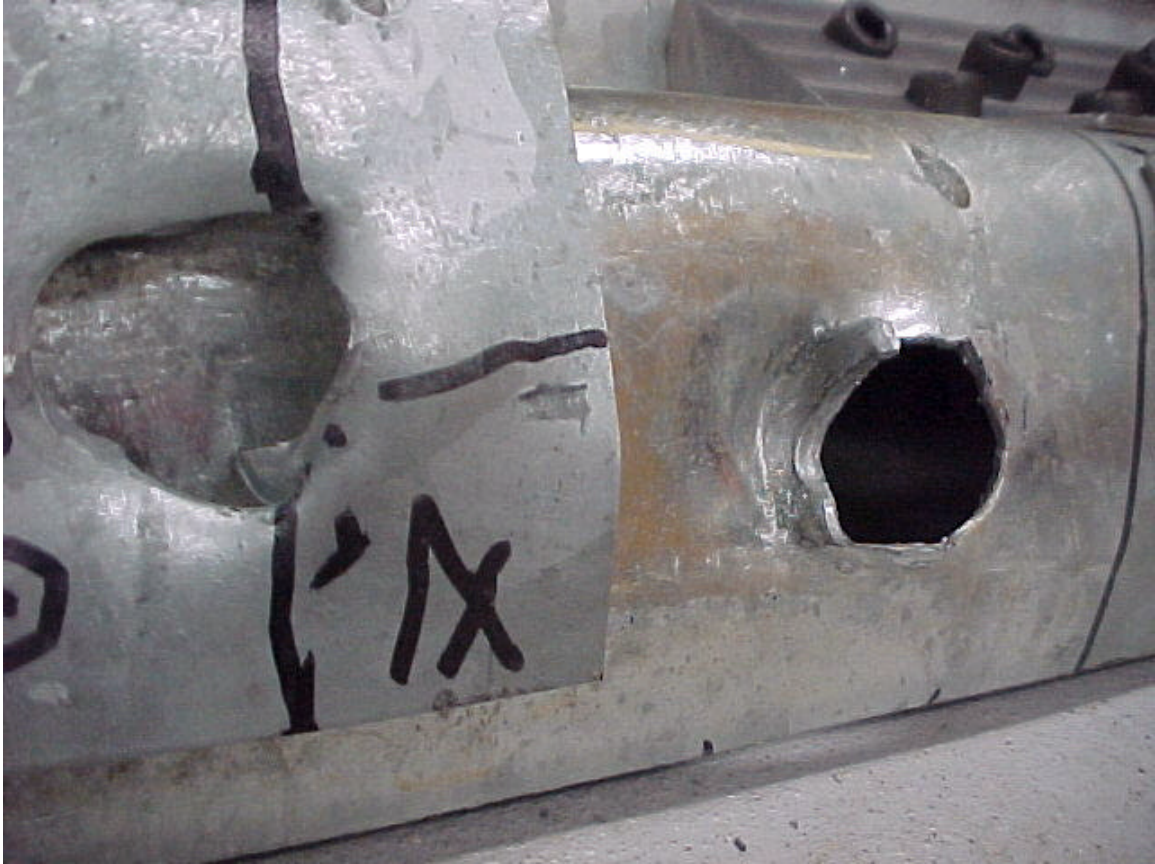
Guardrail damage caused by bolt-head and nut tearing material.
